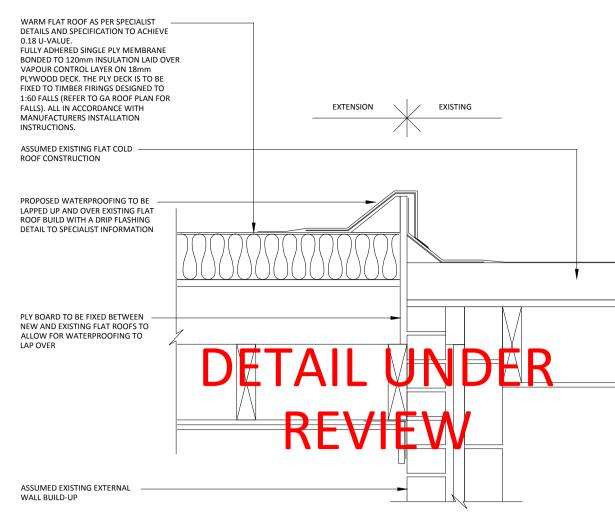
FLAT ROOF AND EXTERNAL WALL JUNCTION DETAIL
